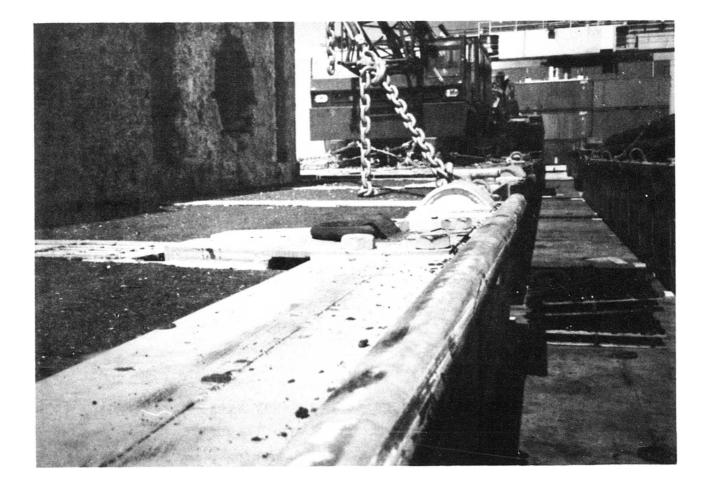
Starboard-Side Chain Plate Installed on Causeway Section. (Note: Adjacent launch rail)
